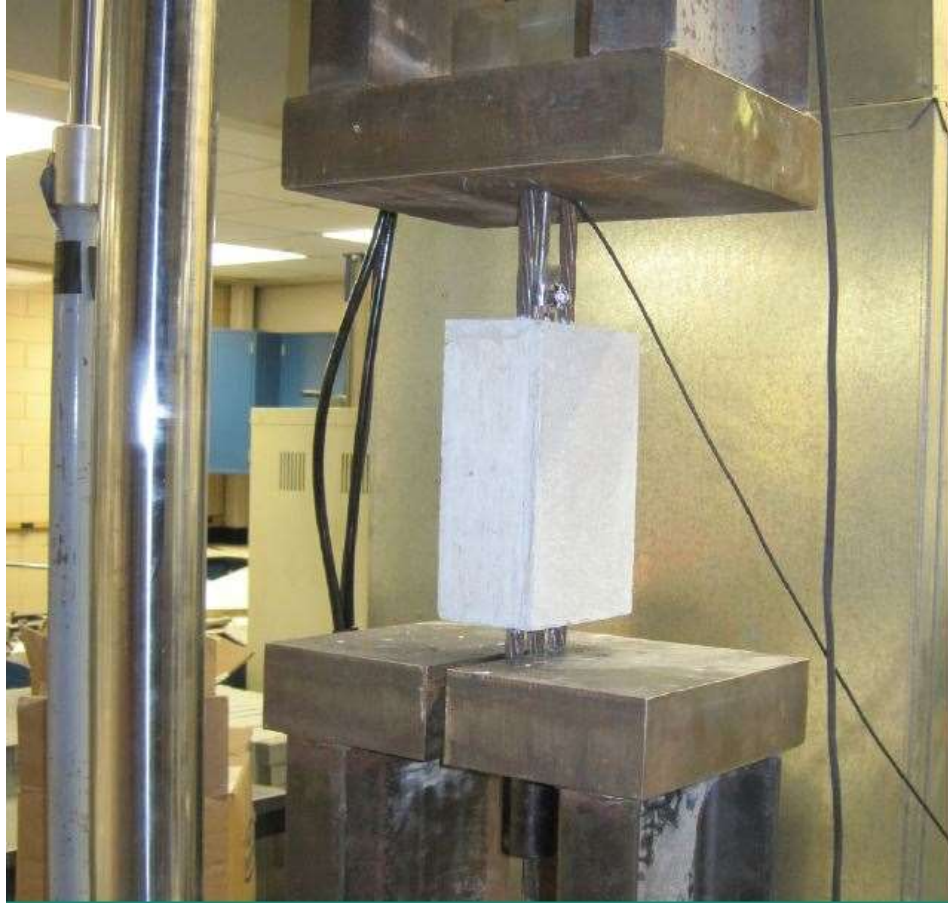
FHWA prestressing strand-UHPC bond test specimen in load frame (Graybeal 2014).
